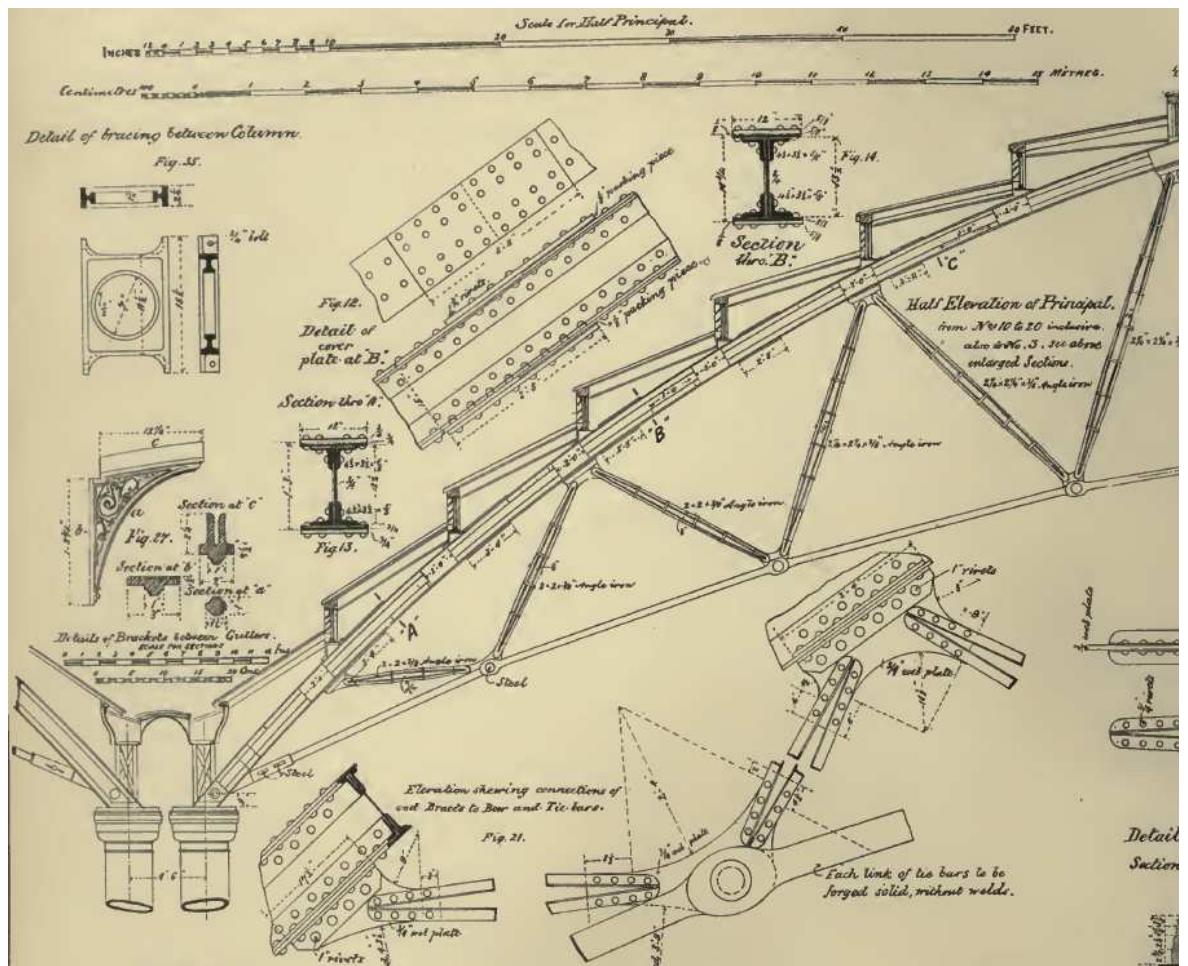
Truss details of Liverpool lime Street Station roof (Walmisley, Plate 37 1888)
